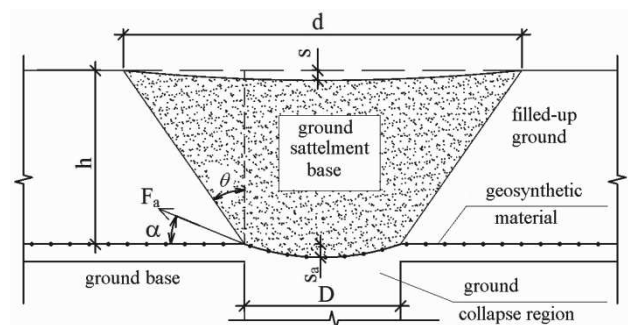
Design diagram of reinforced ground settlement under earth collapse.
